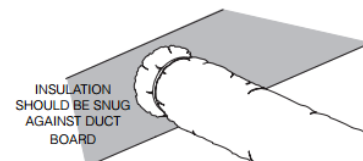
E. Install flexible duct to collar according to manufacturer's instructions.
